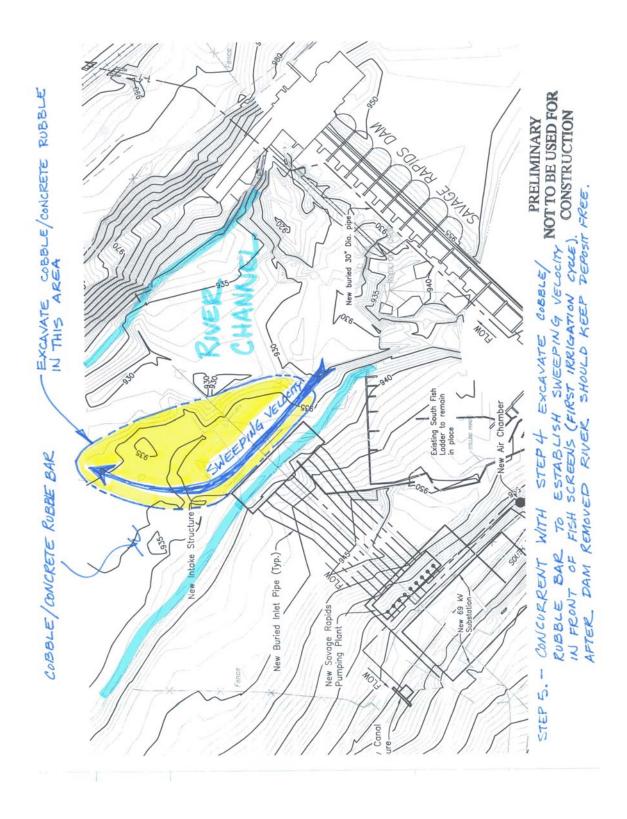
Preliminary site design for Savage Rapids Dam Removal Project, showing location of existing gravel/debris bar in front of new pumping plant.
